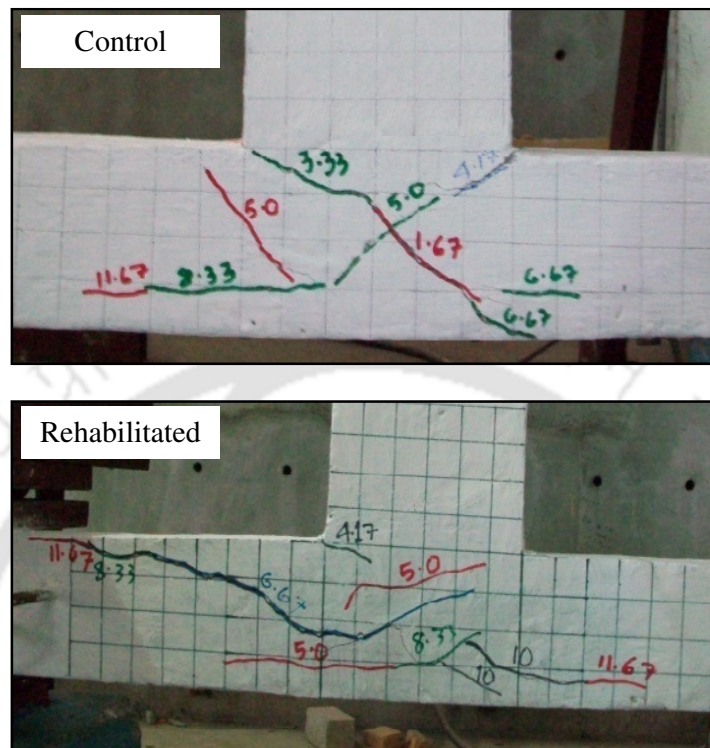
Appearance of cracks for CWSS specimens under loading type-2 corresponding to peak load
